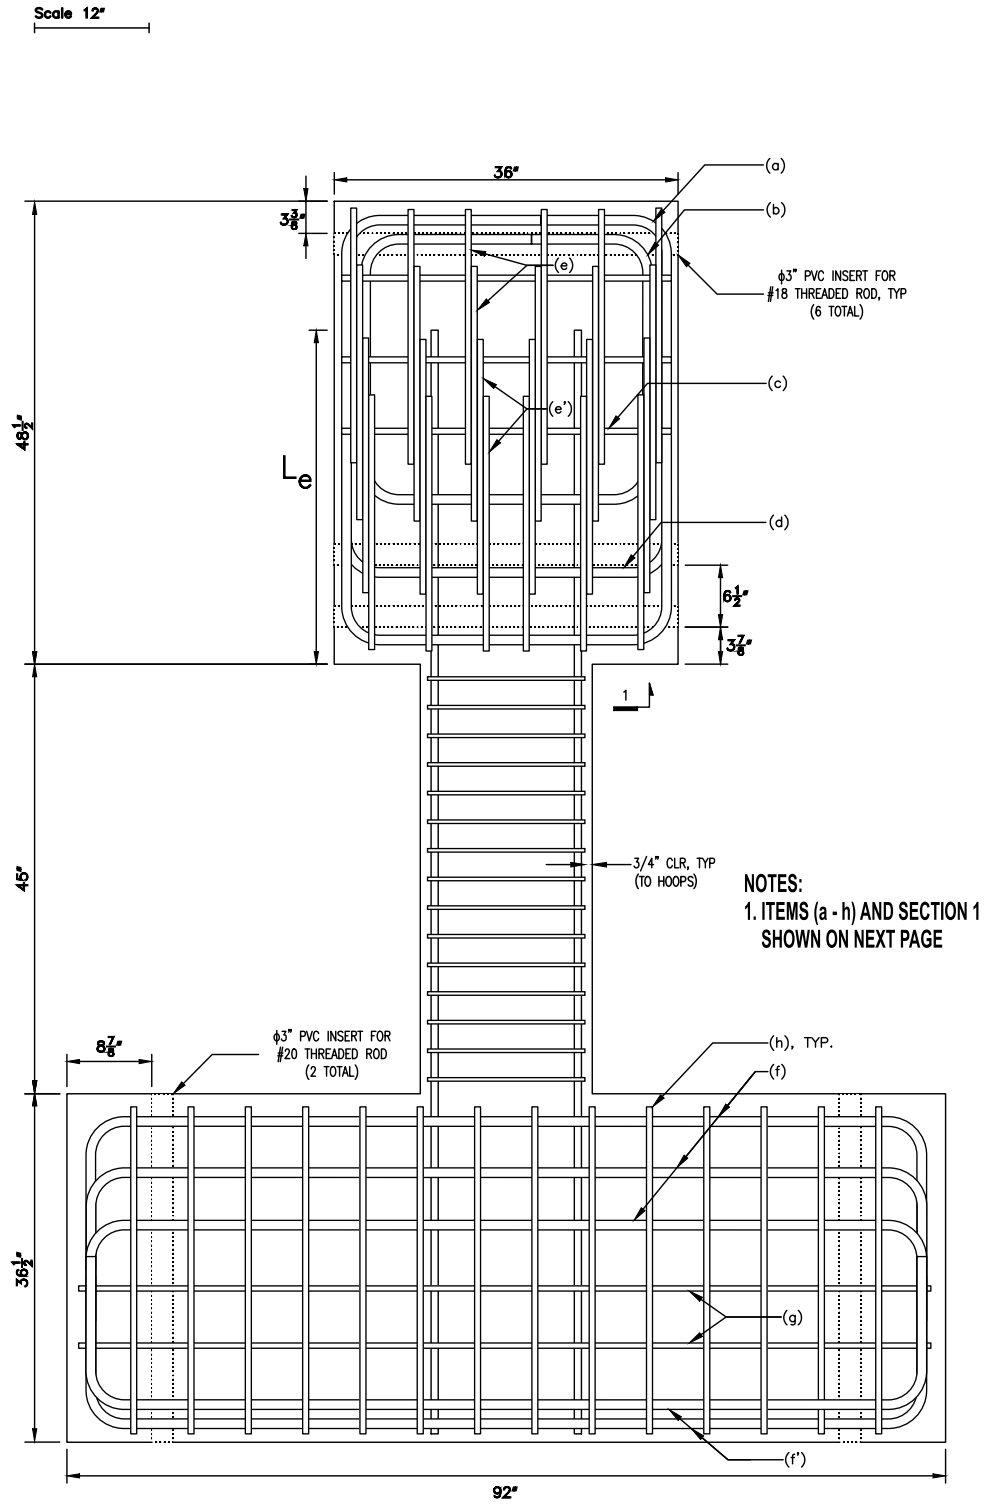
Elevation view of P100-2.5 (1 in. = 25.4 mm)
